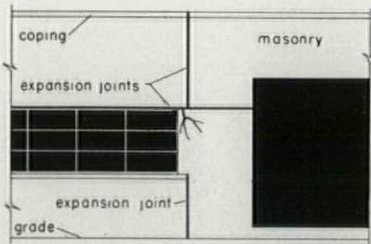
Typical expansion cracks in masonry building when vertical joints are not continuous.
